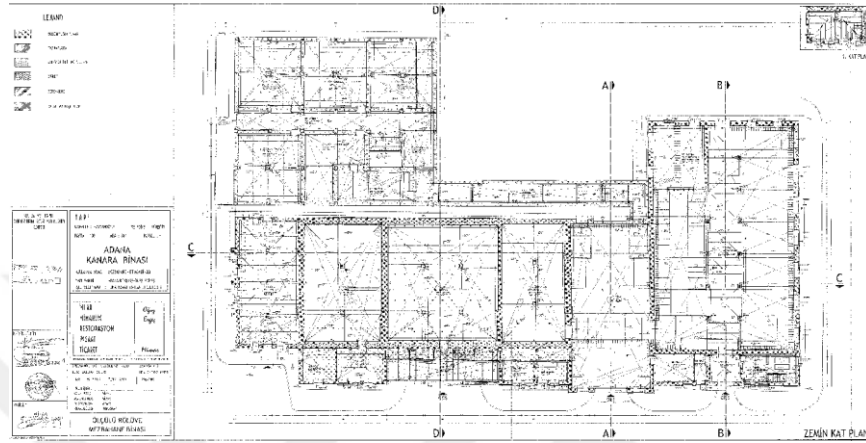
Ground Floor Plan of the slaughterhouse dated 2013 (Source: Oğuz Ergeç archive)
